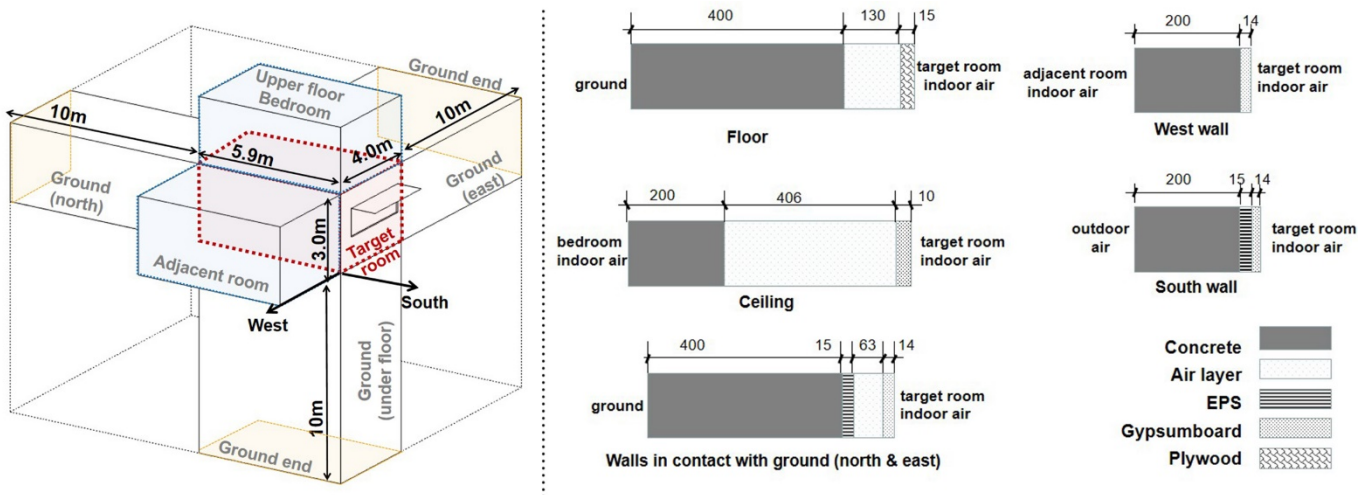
Composition of the building envelopes of the “east room” on the lower floor.
